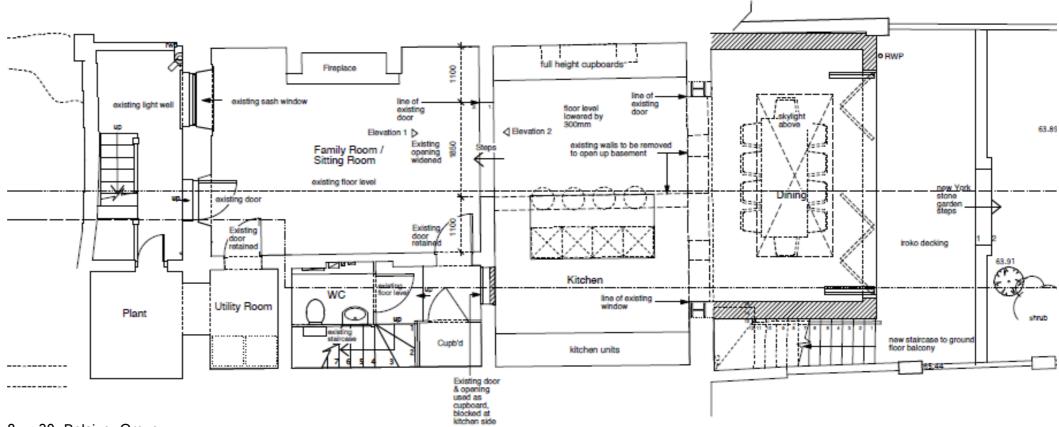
30 Belsize Grove Proposed lower ground floor plan
